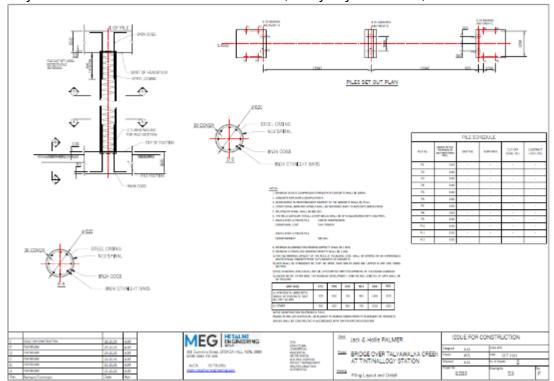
Architectural Drawings/ structural dwgs for installation of preconstructed bridge over Talywalka Creek at Lot3995 in DP 766468, Teryawynia Station,
